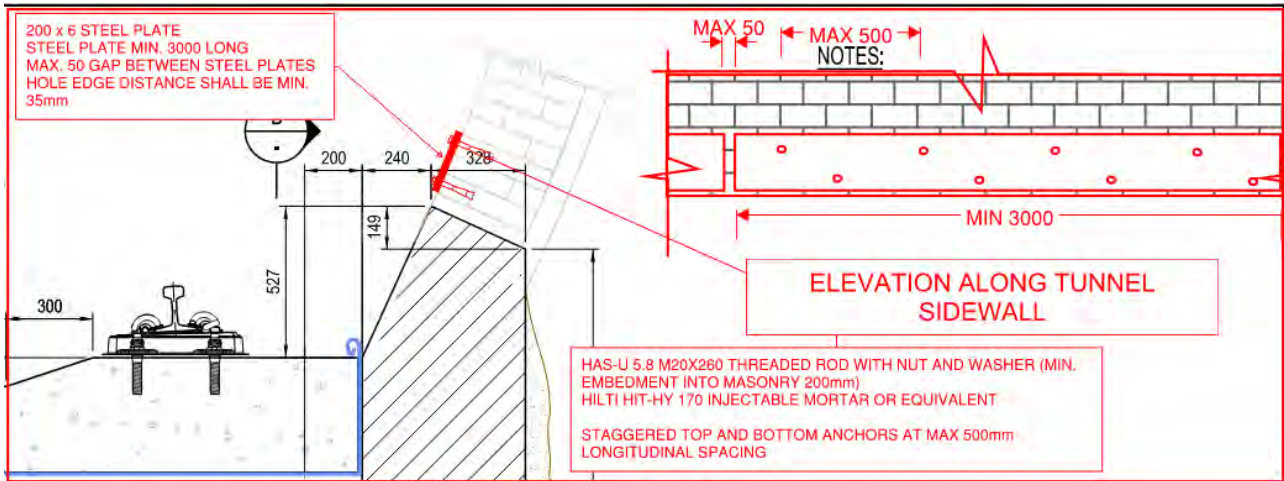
MASONRY WALL EDGE TEMPORARY SUPPORT - STEEL RIBBON TO MAINTAIN STRUCTURAL INTEGRITY OF THE MASONRY (SOURCE: AURECON/VLINE)
